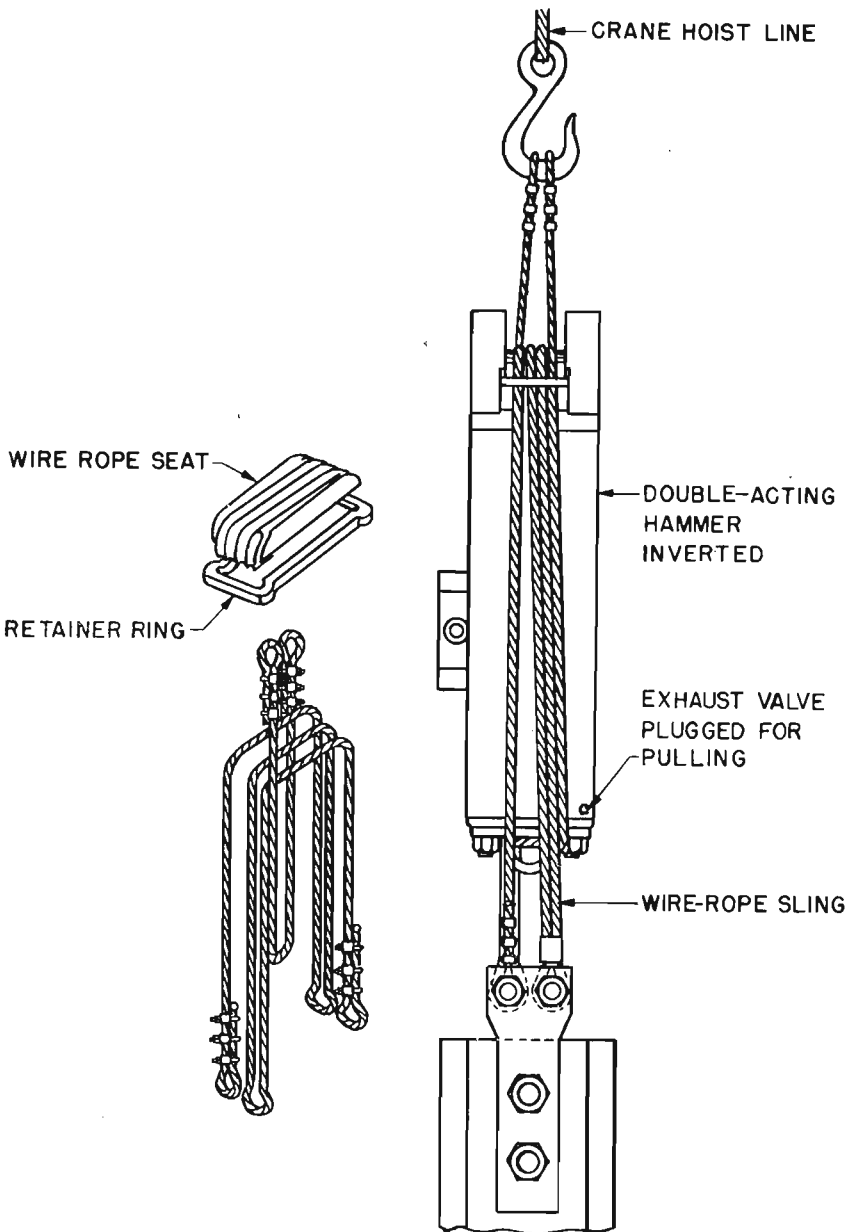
Wire-rope sling stream-pneumatic-hammer assembly used to pull piles. Exhaust valve must be plugged for pulling.
